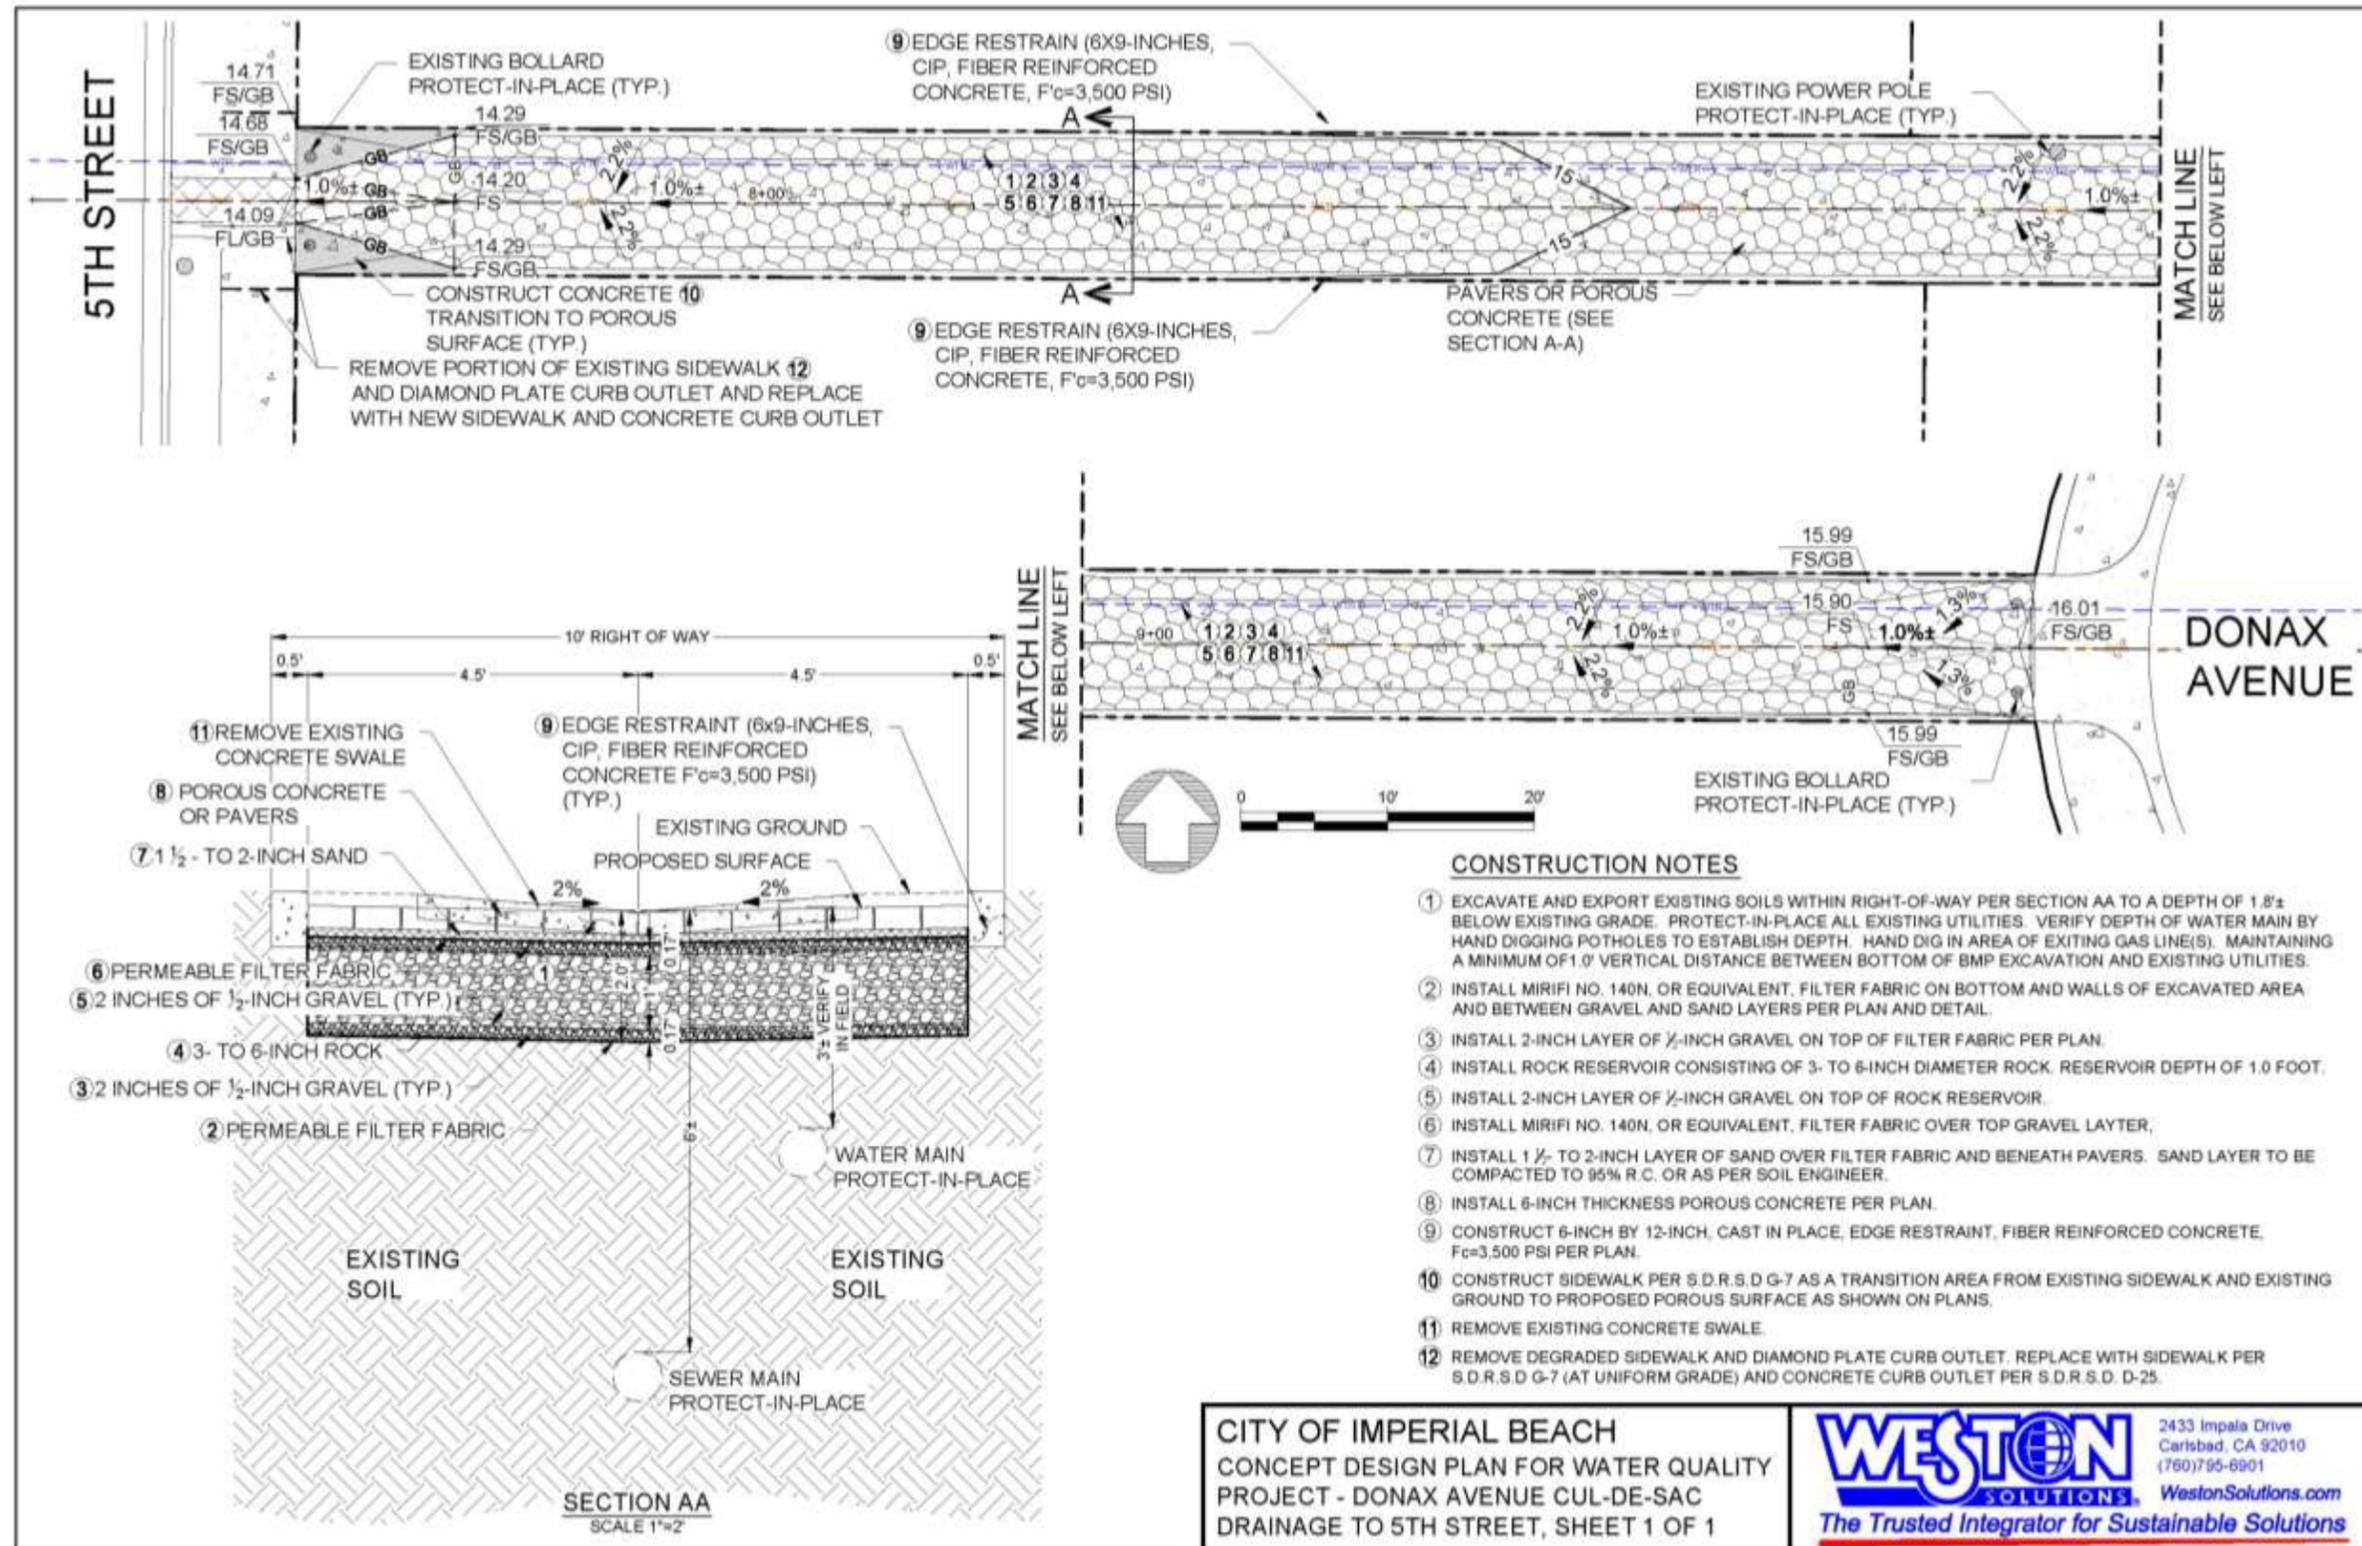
Donax Avenue Cul-De-Sac Drainage Right-of-Way Concept Design Plan
